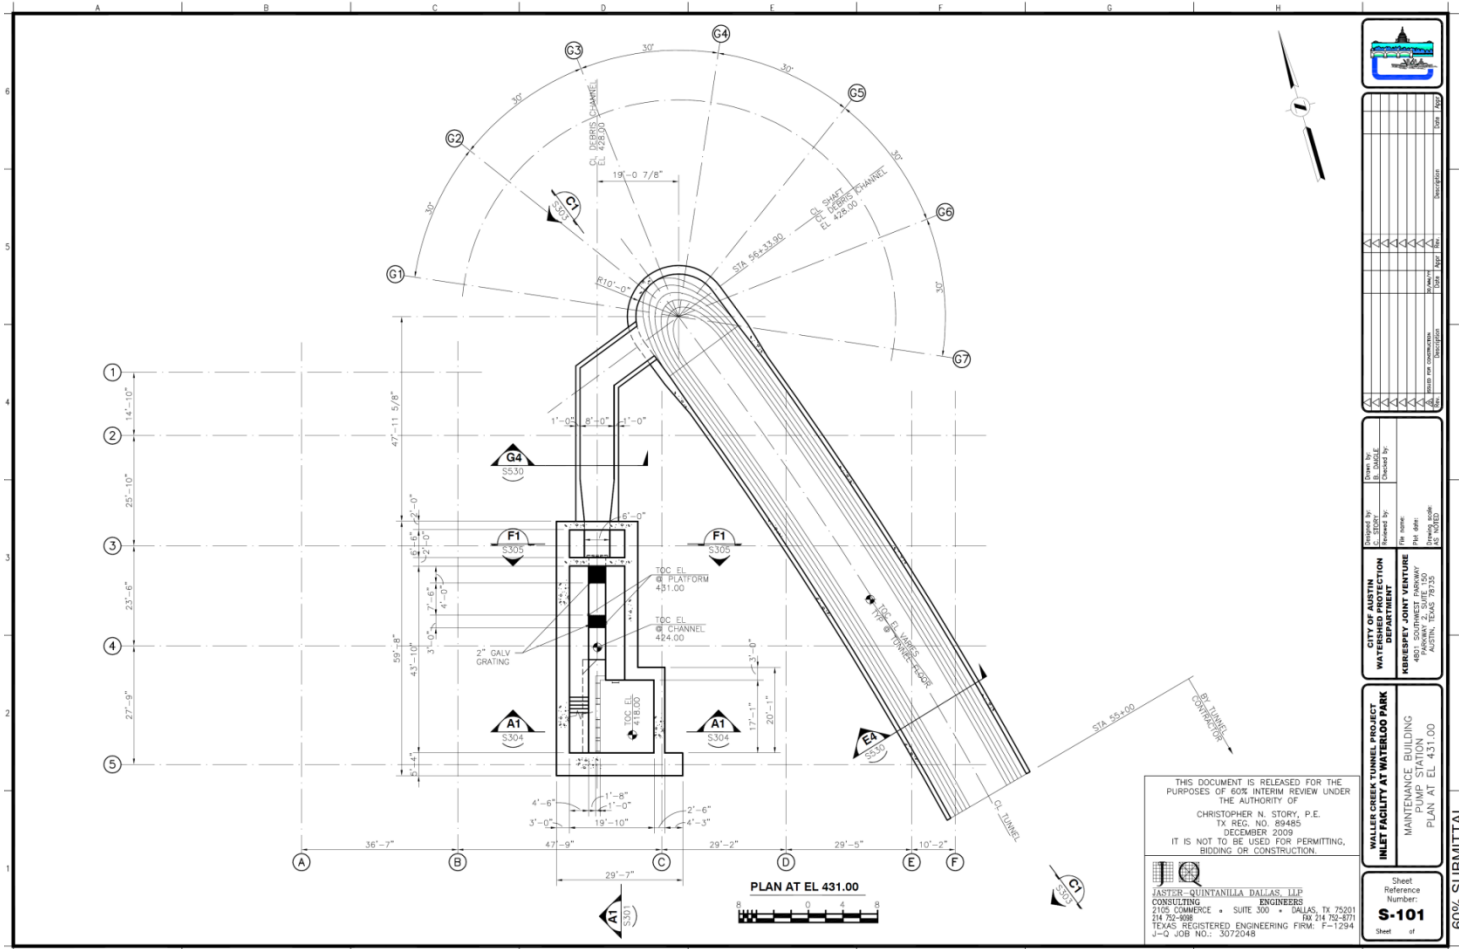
Waller Creek Tunnel Project; Morning Glory Spillway – Plan at EL 431
